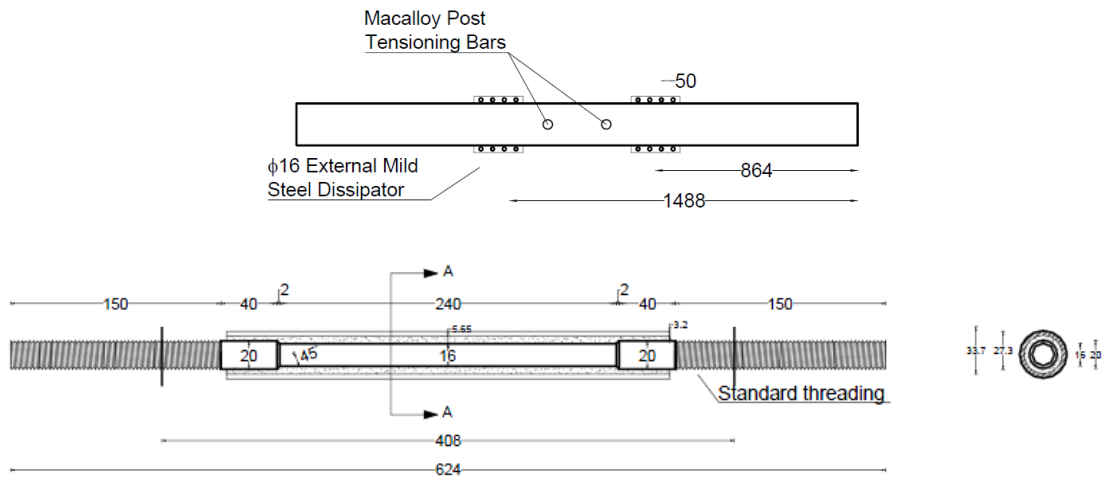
Post Tensioned Wall Section with $\phi 16$ External Mild Steel Dissipators
